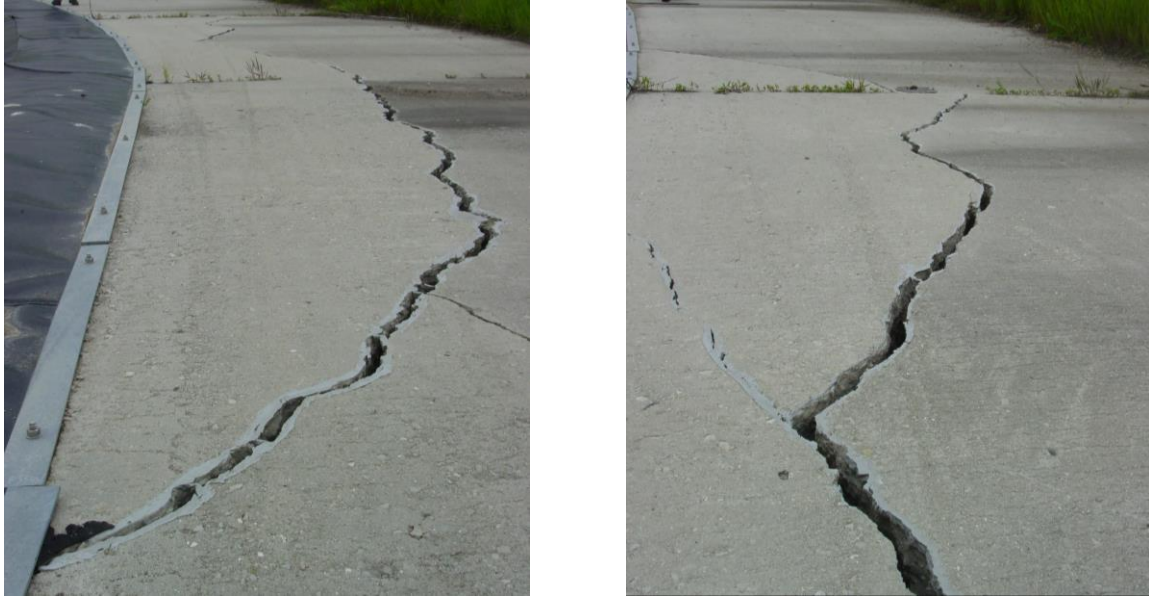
Largest crack along the bench. 1- to 2-inch wide crack parallel to slope. This crack has been opening, indicating that the northwest lower slope is of marginal stability.
